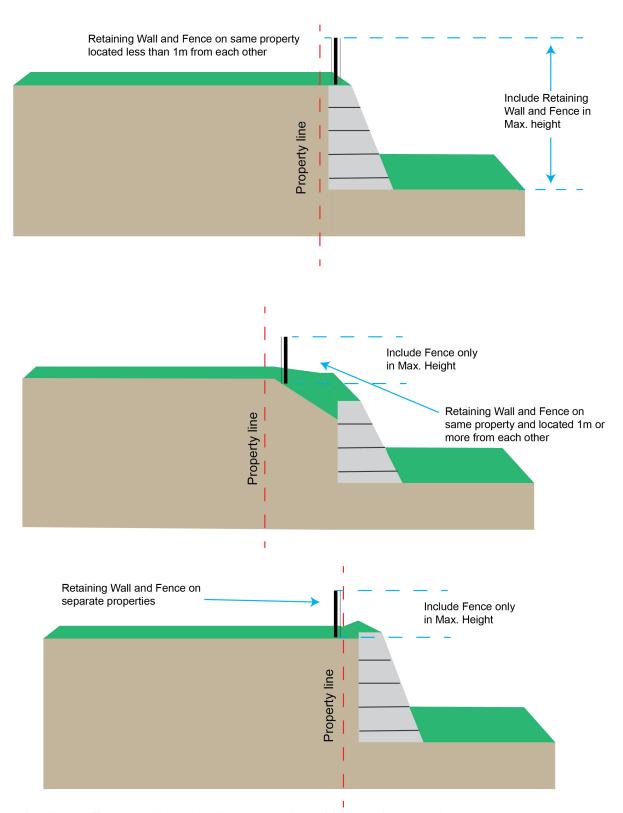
Maximum Fence height when in conjunction with a retaining wall
